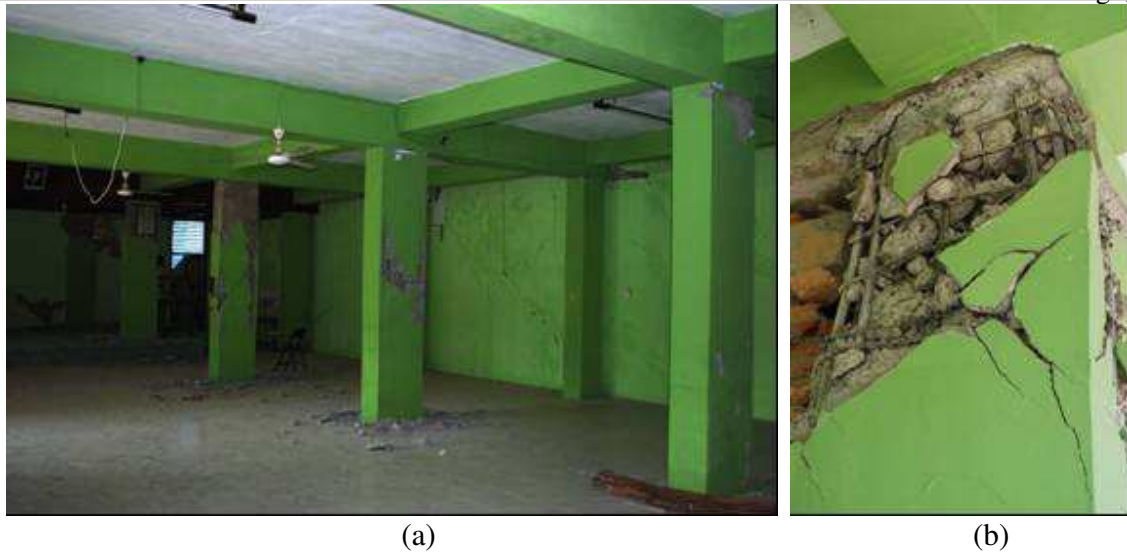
Severe damage on reinforced concrete buildings in Padang city due to low quality of concrete strength in column
